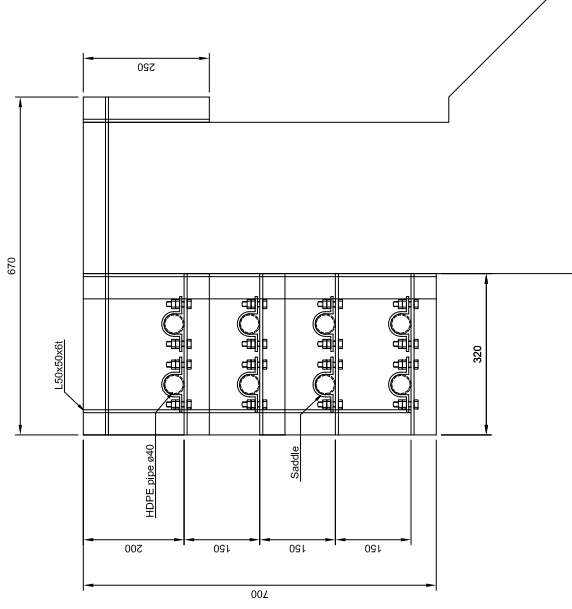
DETAIL OF COMMUNICATION DUCT (TYPE B1) ON BRIDGE
